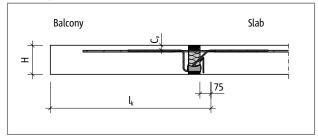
Schöck Isokorb® T type K-E, K-T: Static system, cross-section
